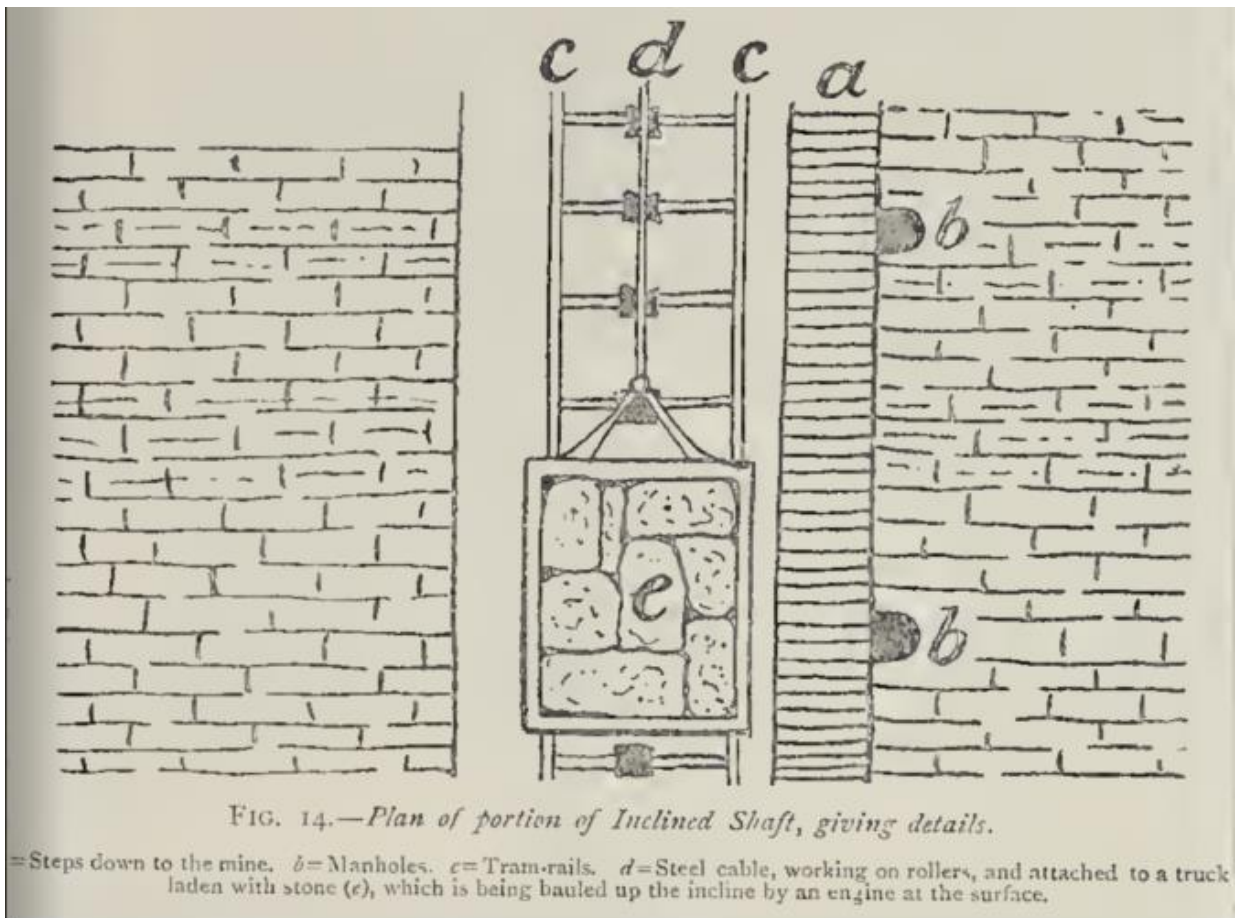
Plan of portion of Inclined Shaft, giving details.
